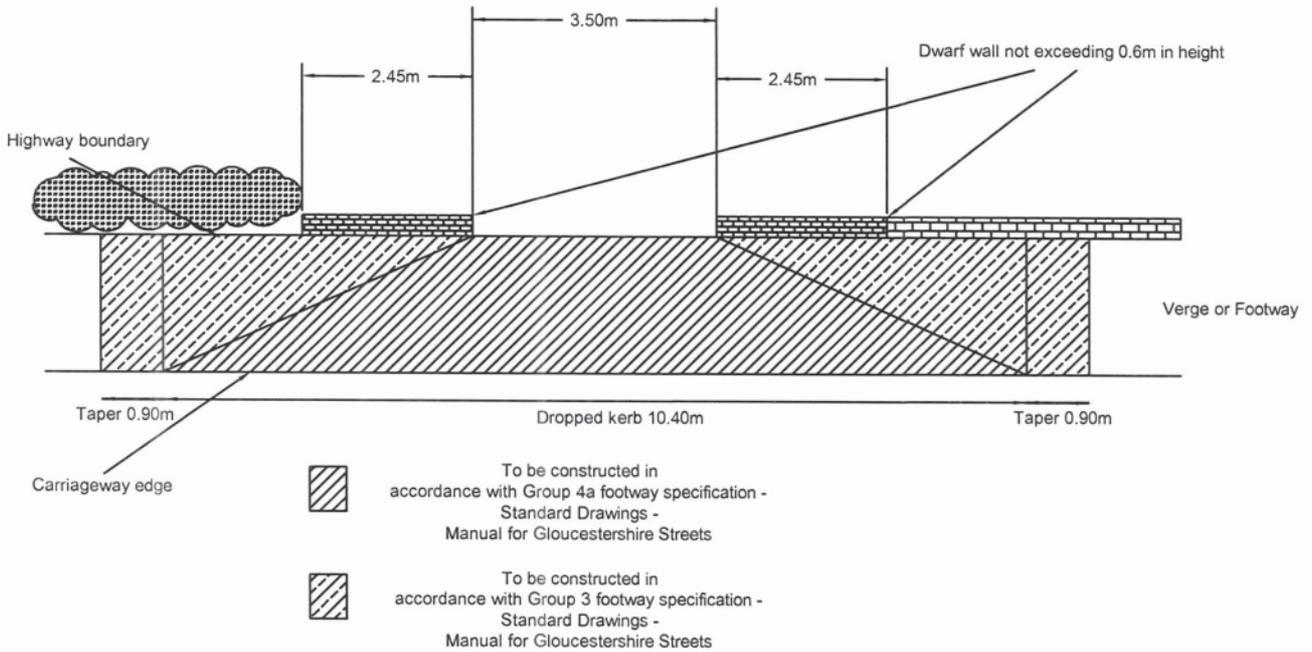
Standard access to 1 dwelling over highway verge (no kerb).
